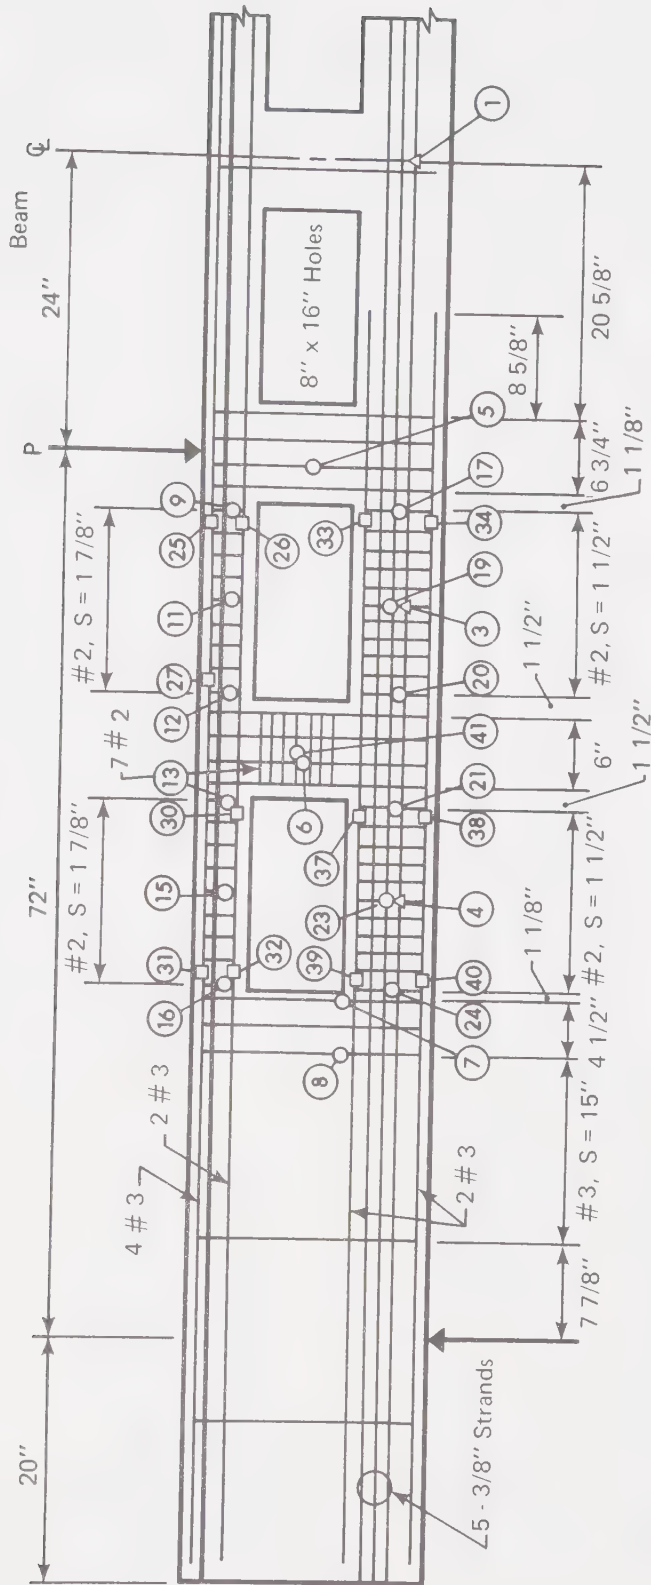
Reinforcement Details and Strain Gage Locations for Beam 19-16-6
